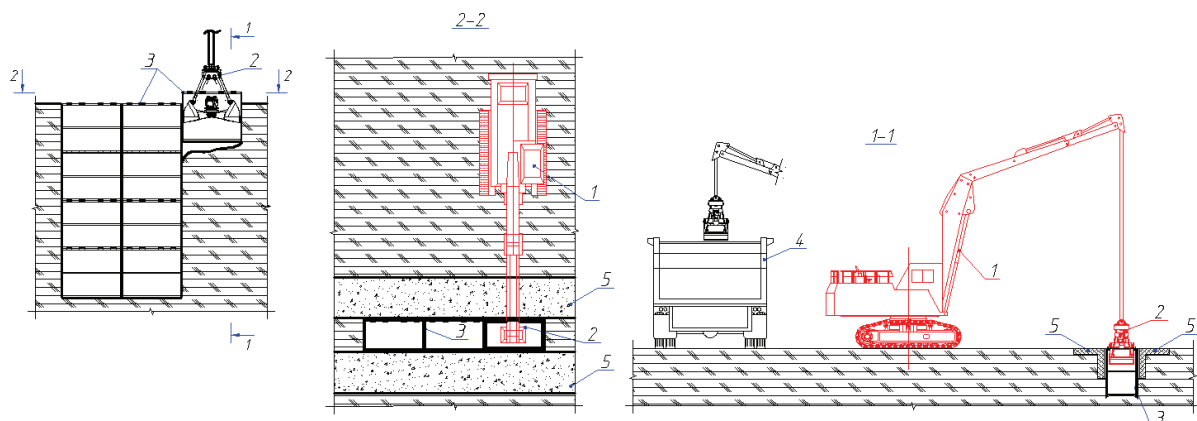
The technological diagram of ground extraction inside of the immovable metal formwork: 1 – an excavator; 2 – a clamshell equipment on the pressure bar; 3 – a immovable metal formwork; 4 – a truck; 5 – a guide wall.
